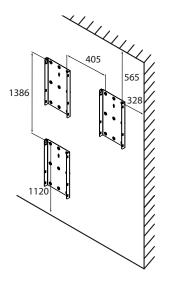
Drill stencil for wall mounting with minimum clearances (in mm)
